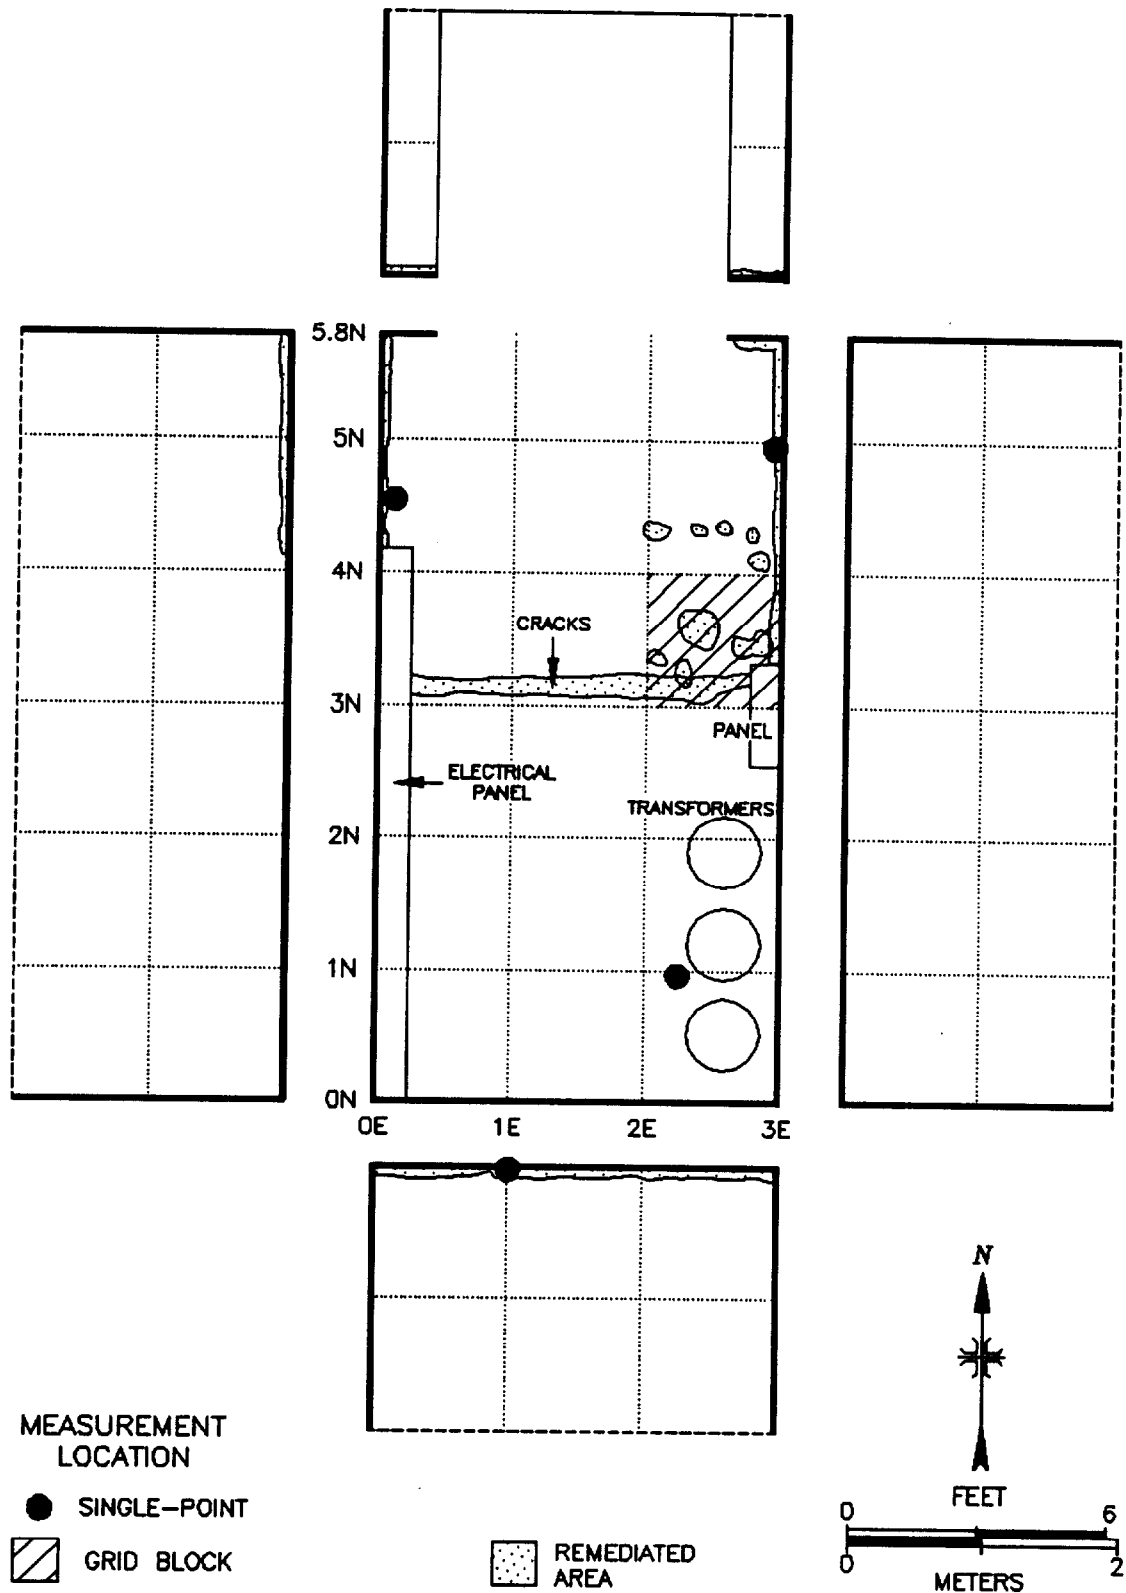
Building 31, Electrical Equipment Room #3 – Remediated Areas and Measurement Locations
